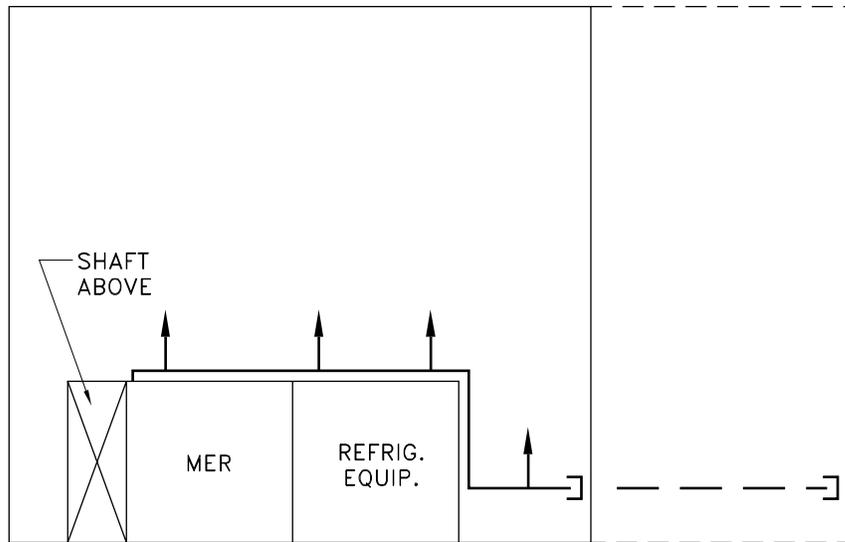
Acceptable Location for MER in CO Equipment Building (2-Bay Extension)
